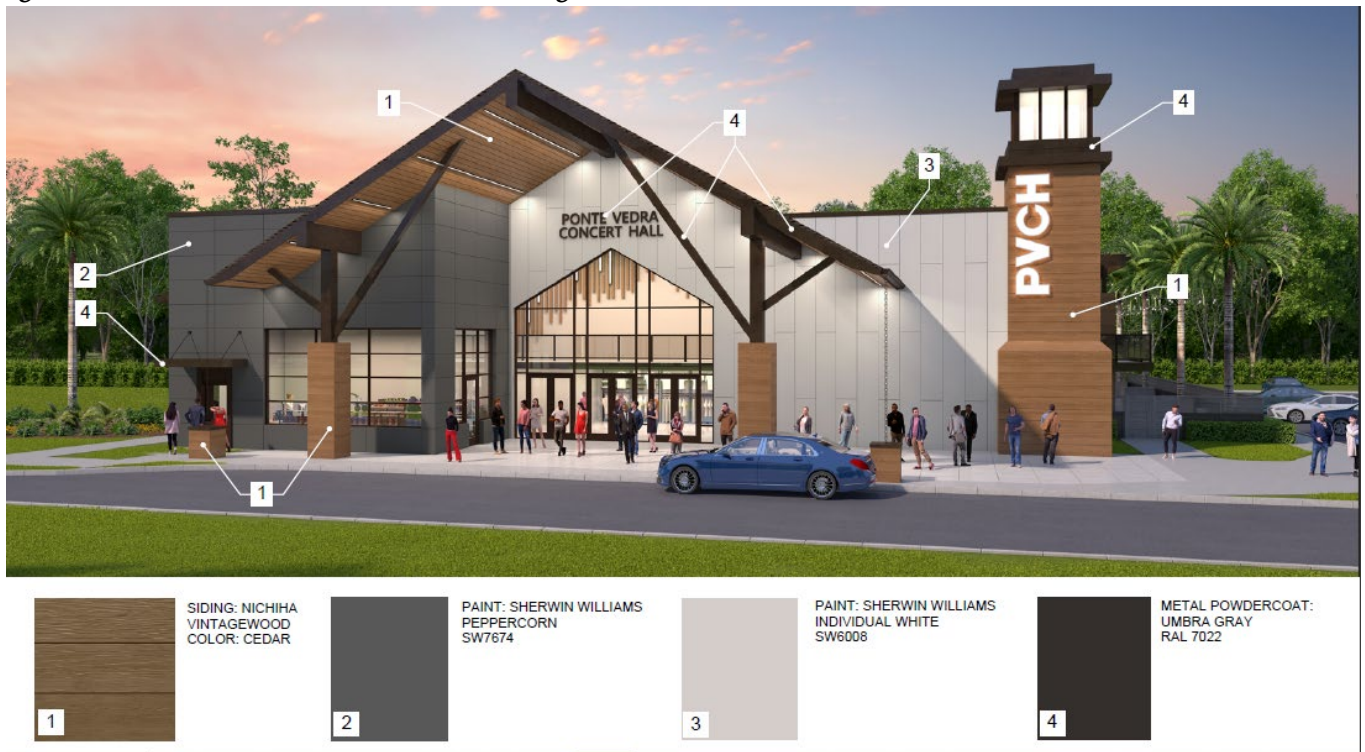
Ponte Vedra Concert Hall Renders Cont.
